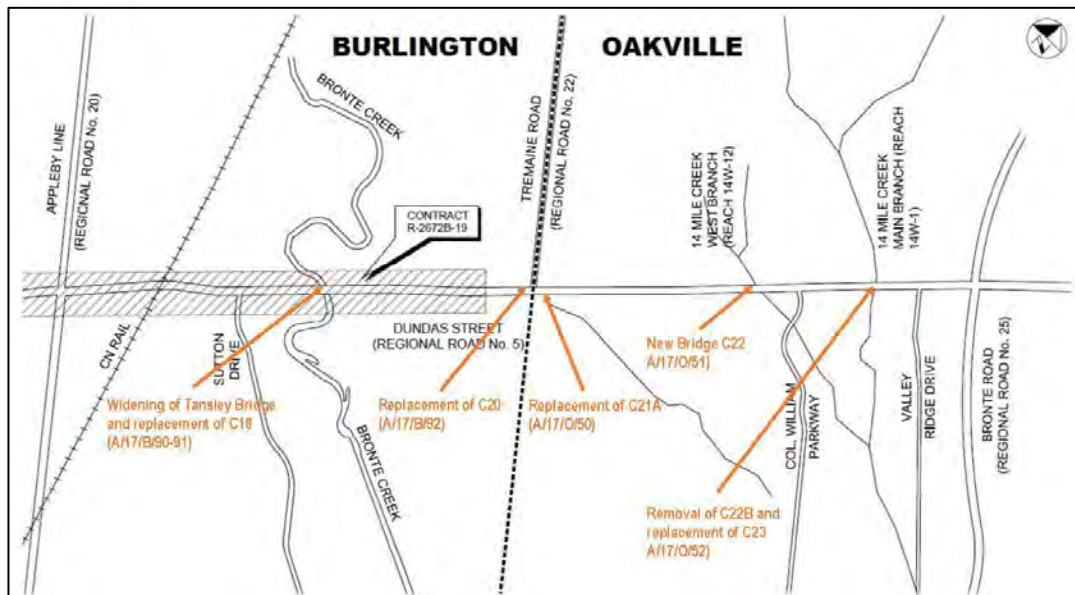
Proposed Widening and Reconstruction of Dundas Street with CH Permit File Numbers
